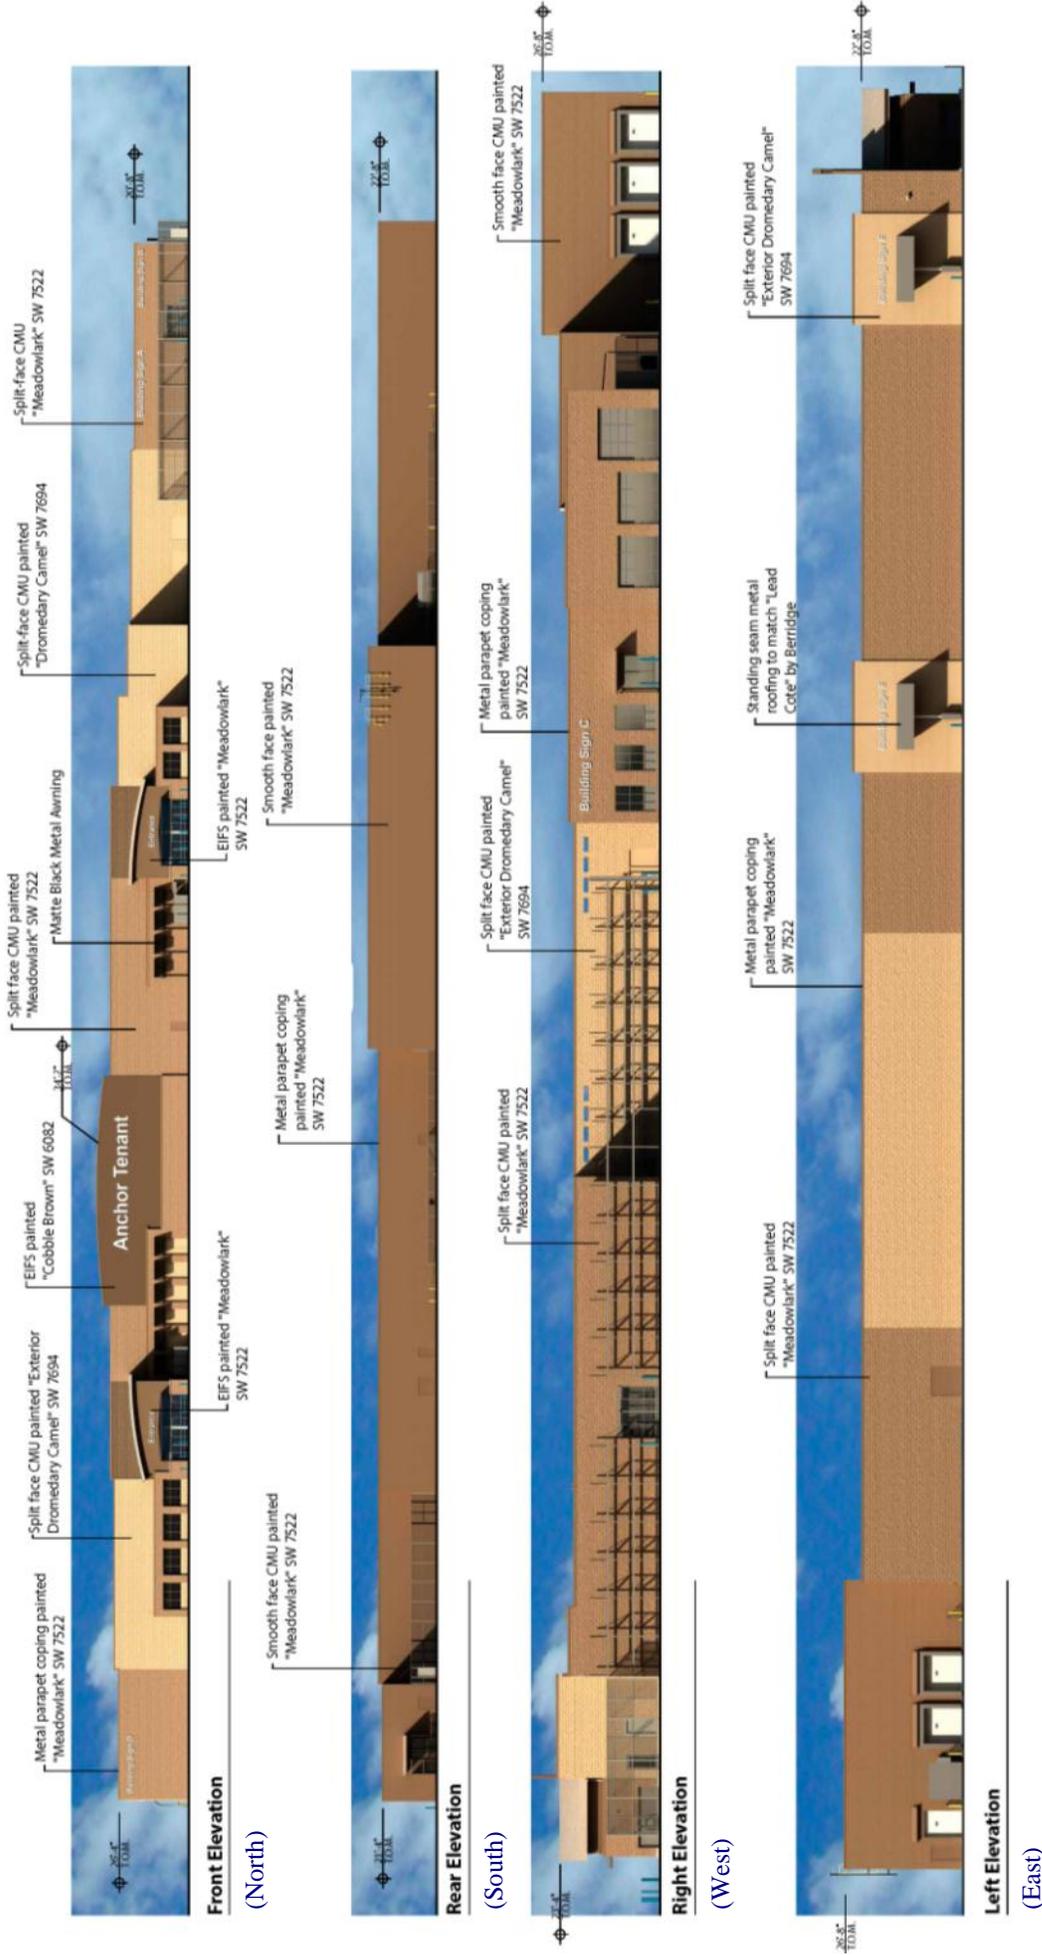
EXHIBIT E - EAST GREAT FALLS BUILDING ELEVATIONS
